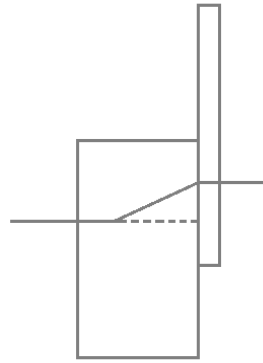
Wood bearing failure under washer and nut
